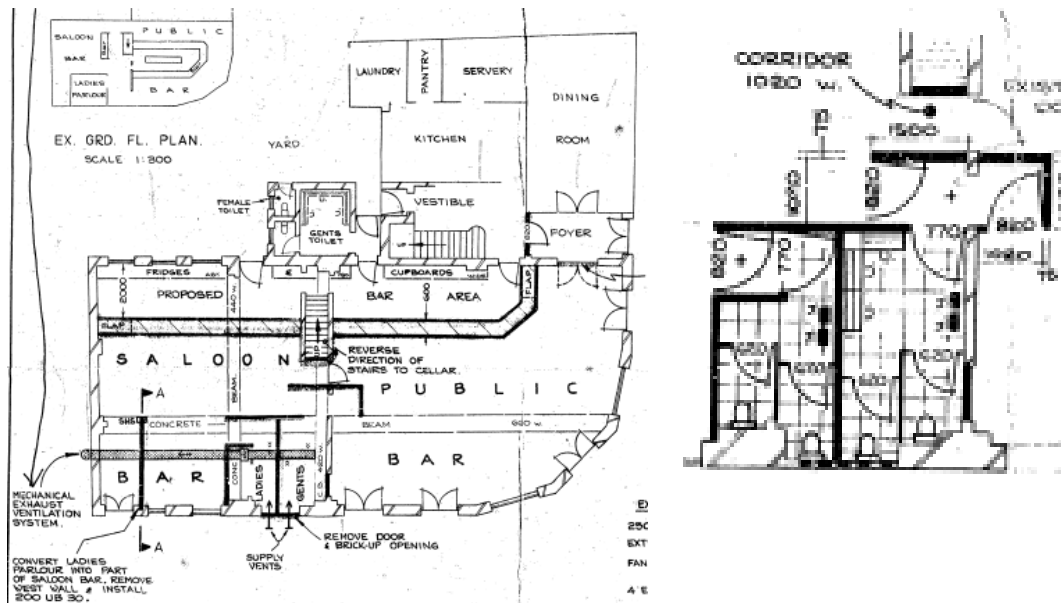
Plans and elevation extracted from the drawing accompanying the building application for modifications to the saloon bar, 1988.
